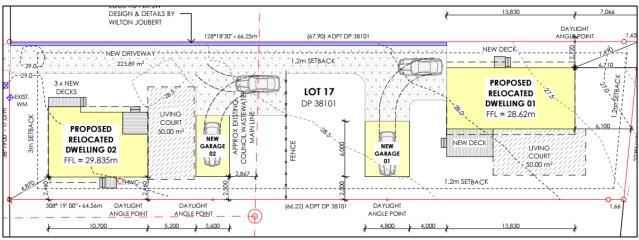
Excerpt from the Site Plan SOURCE: Site Plan – NZADS Ltd
